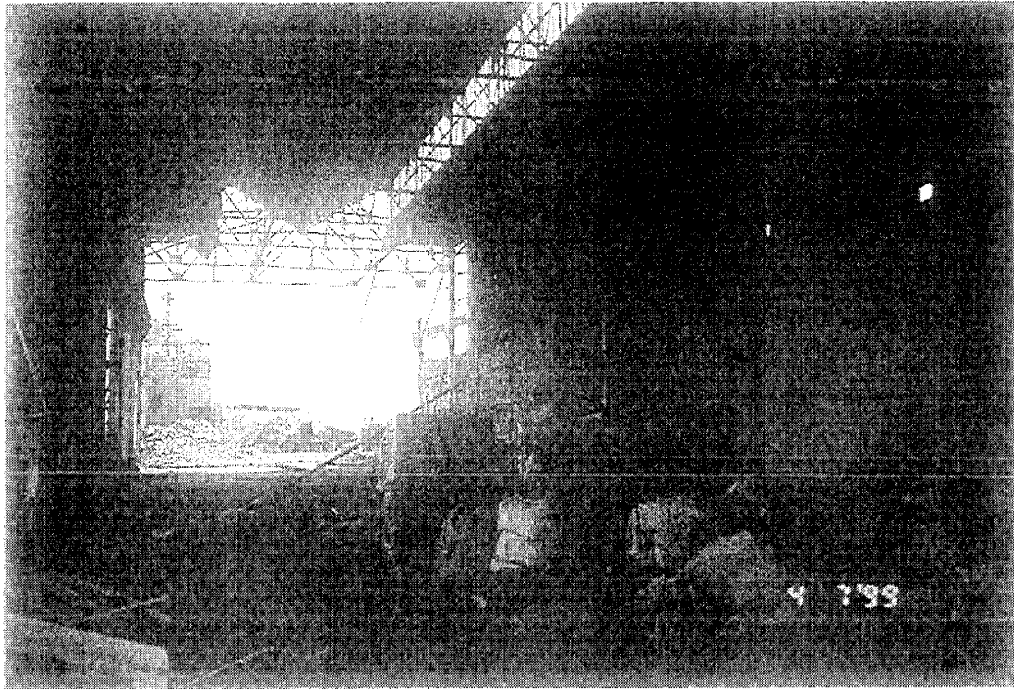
View of the interior of the building shell at the Hazorb Site from the north end, facing south-southwest.
